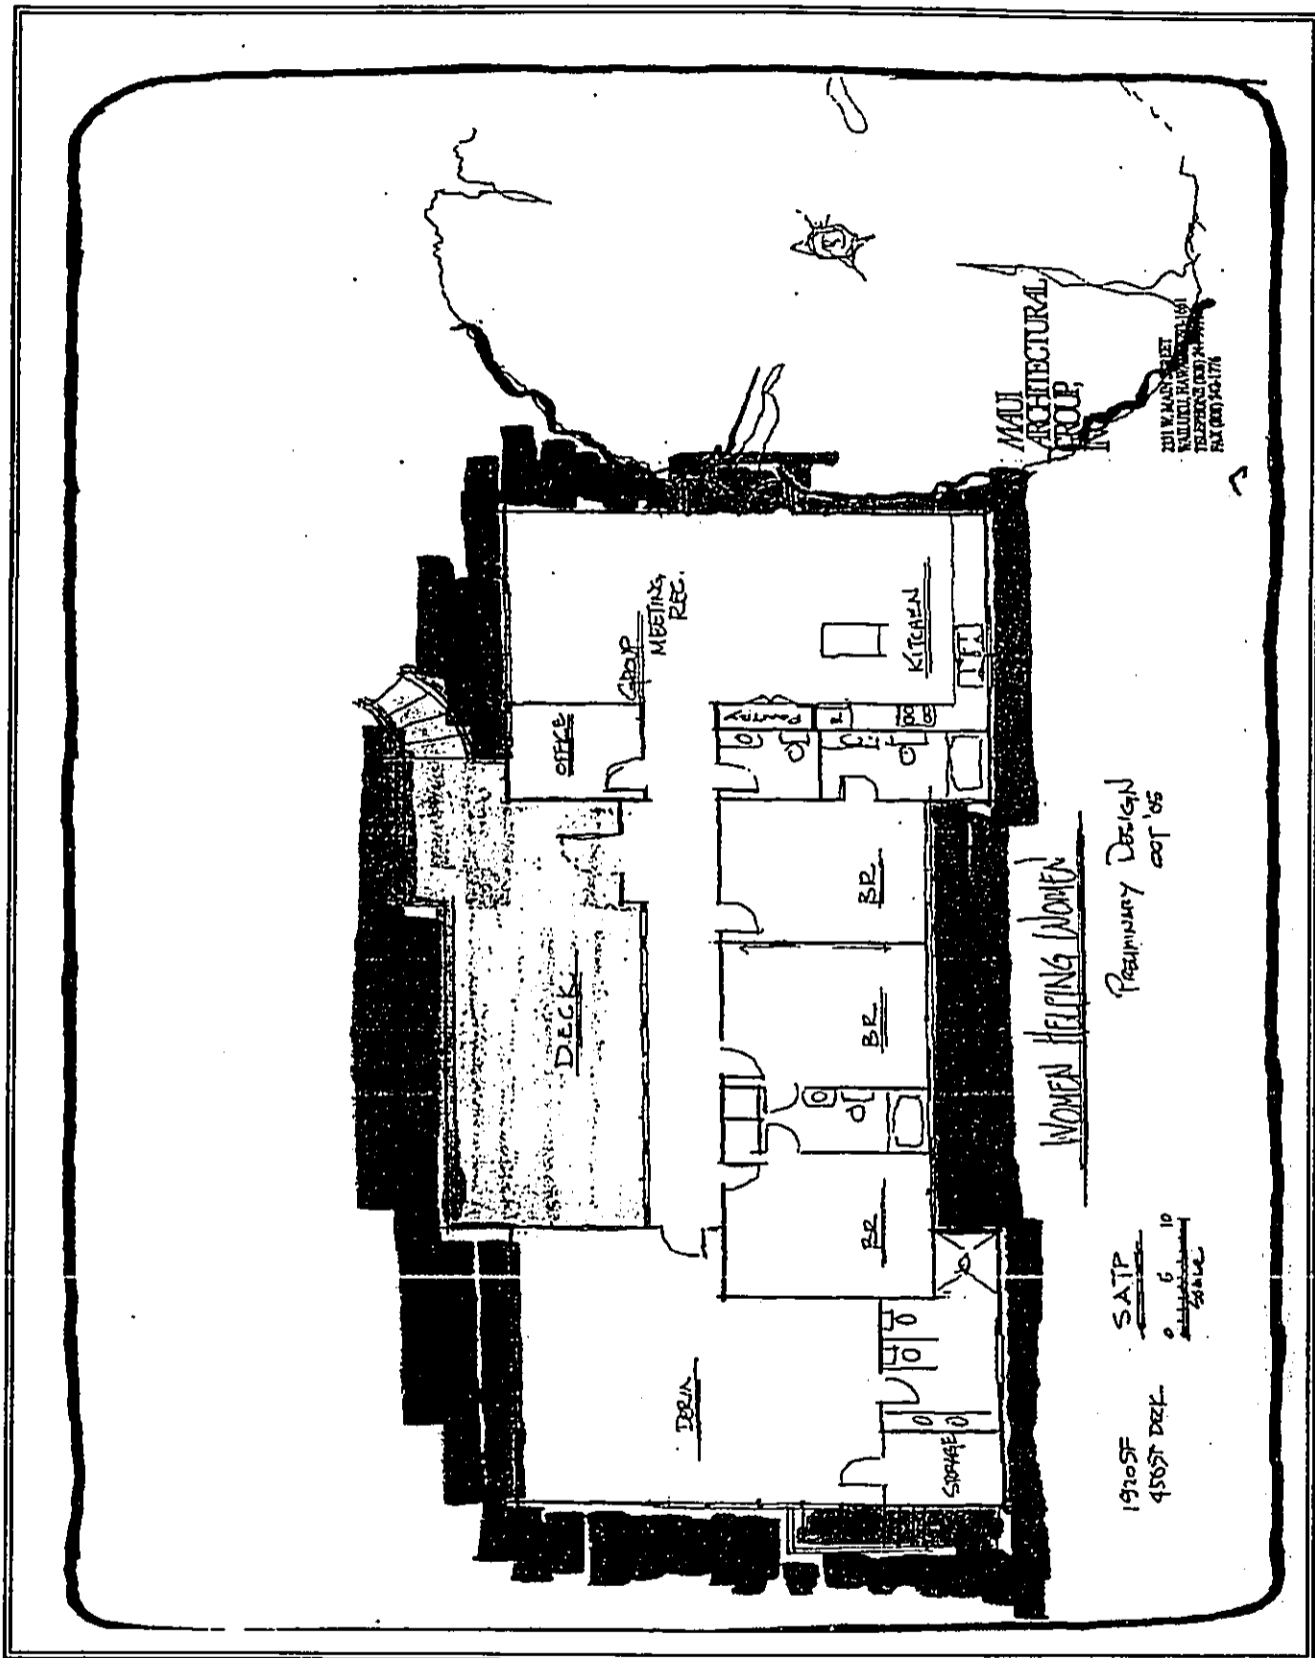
FIGURE II.f – Floor plan of proposed Substance Abuse Shelter (SATP) ; for more detailed drawings please refer to Appendix D.
